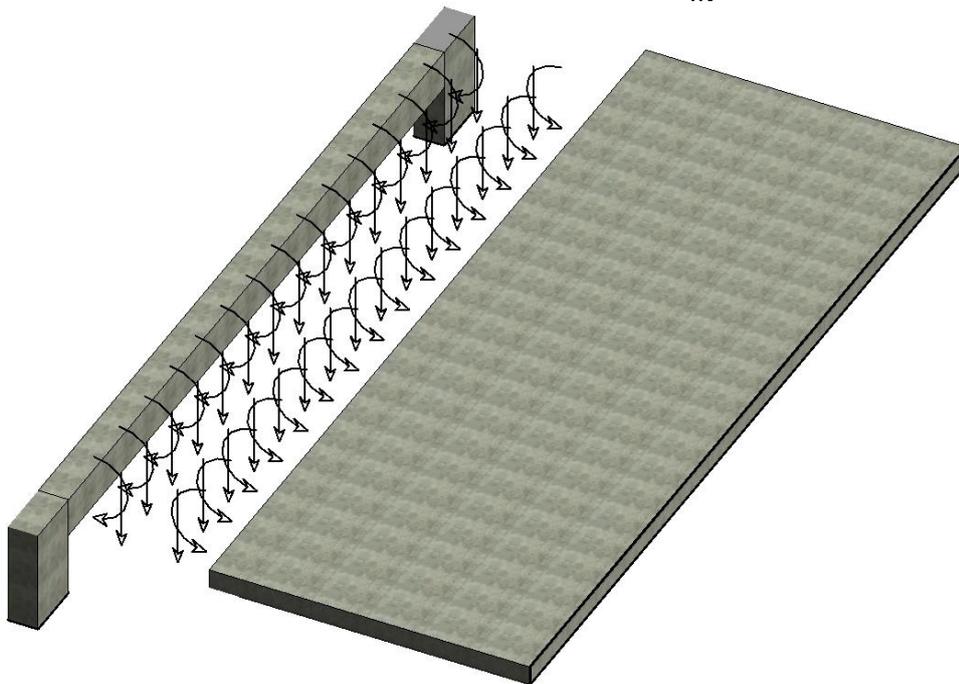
Forces transformed from supported slab to the supporting beam.
